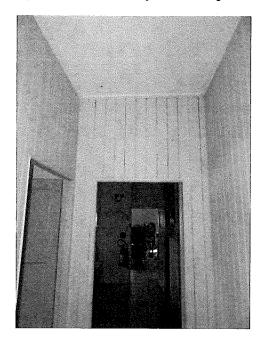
ACMA Facility Main Building interior hallway leading to accommodation (left) and kitchen.
